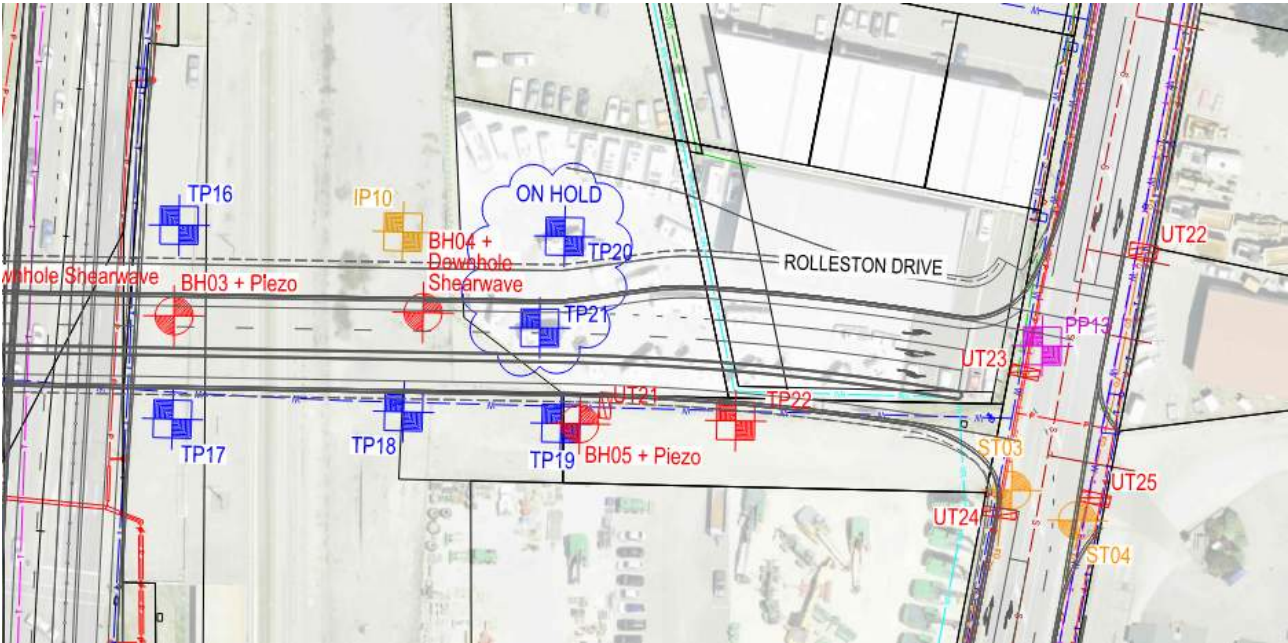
Test Pits TP20 & TP21 Location Plan
